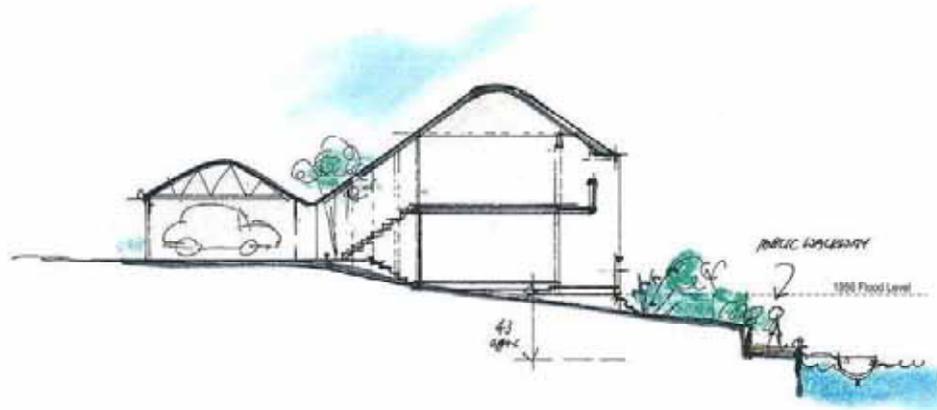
Northern villa waterfront, typical floor plan (2)
